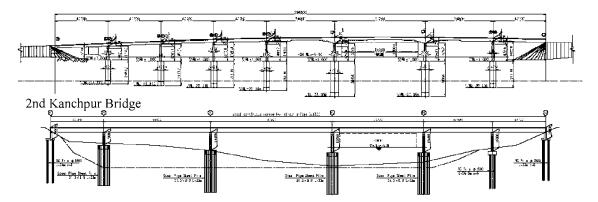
Comparisons of Bridge Shape of Existing and 2<sup>nd</sup> Kanchpur Bridge
